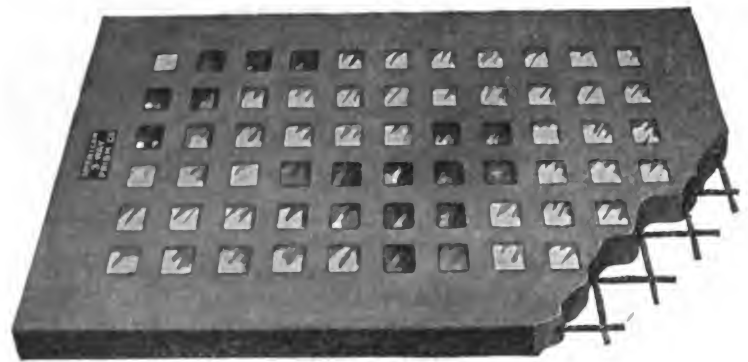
SIDEWALK LIGHT SLAB OF REINFORCED CONCRETE
